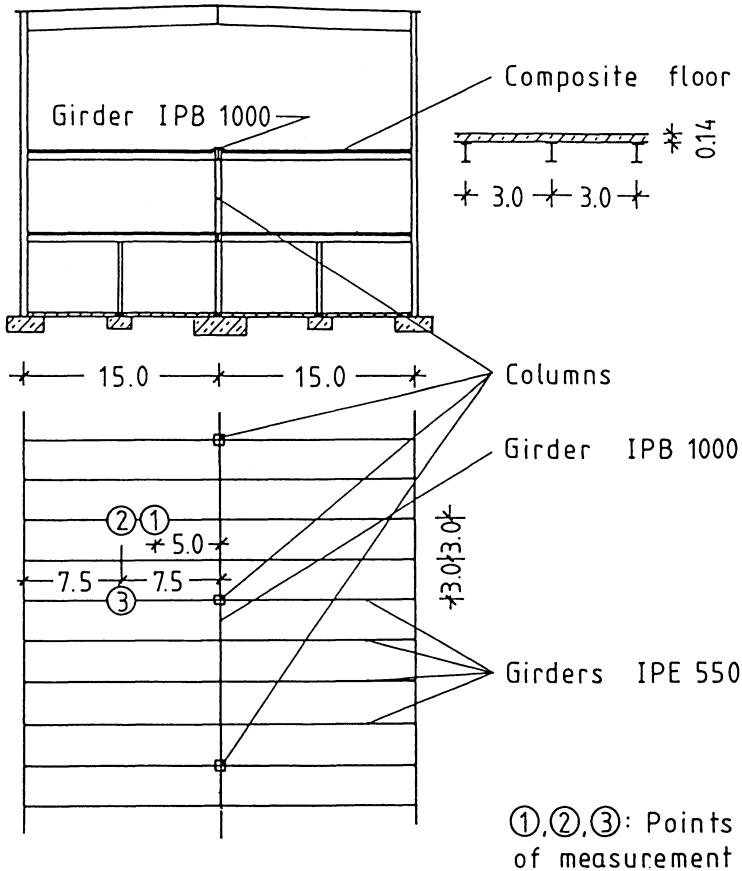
Exhibition hall with a composite deck, Berlin, West Germany
